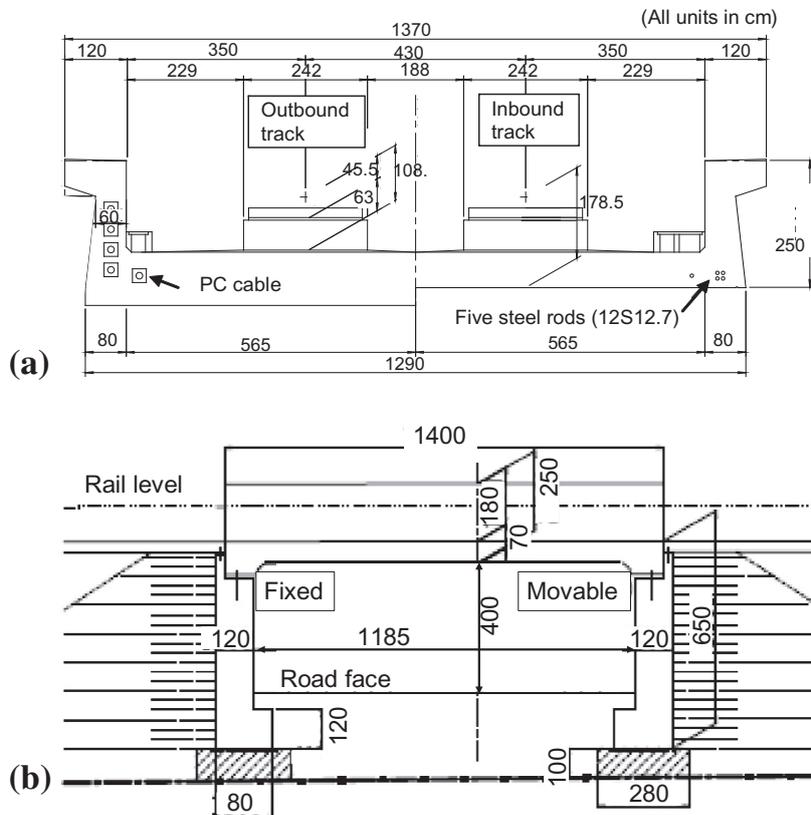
PC through bridge (alternative plan 1): (a) transversal cross-sections of the girder at the top of the facing (left) and the center (right); and (b) longitudinal cross-section of the bridge.
